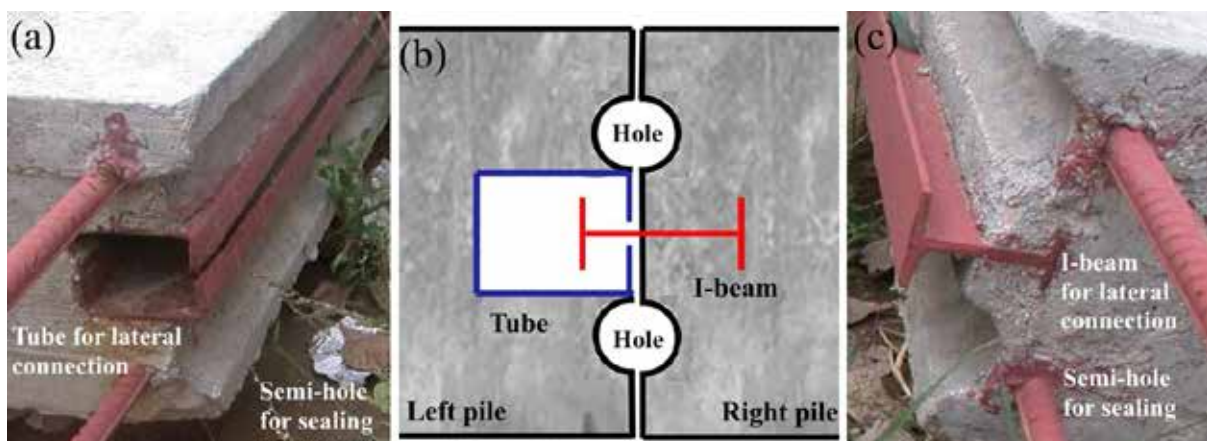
Steel tube or I-beam and two semi-circular hole on one side surface of pile for connection with grout in-situ
